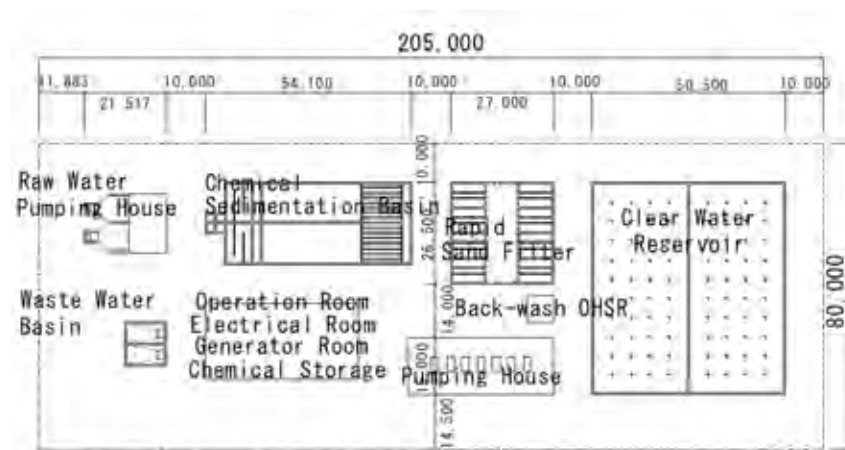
General Layout of Water Treatment Plant for East Bank
